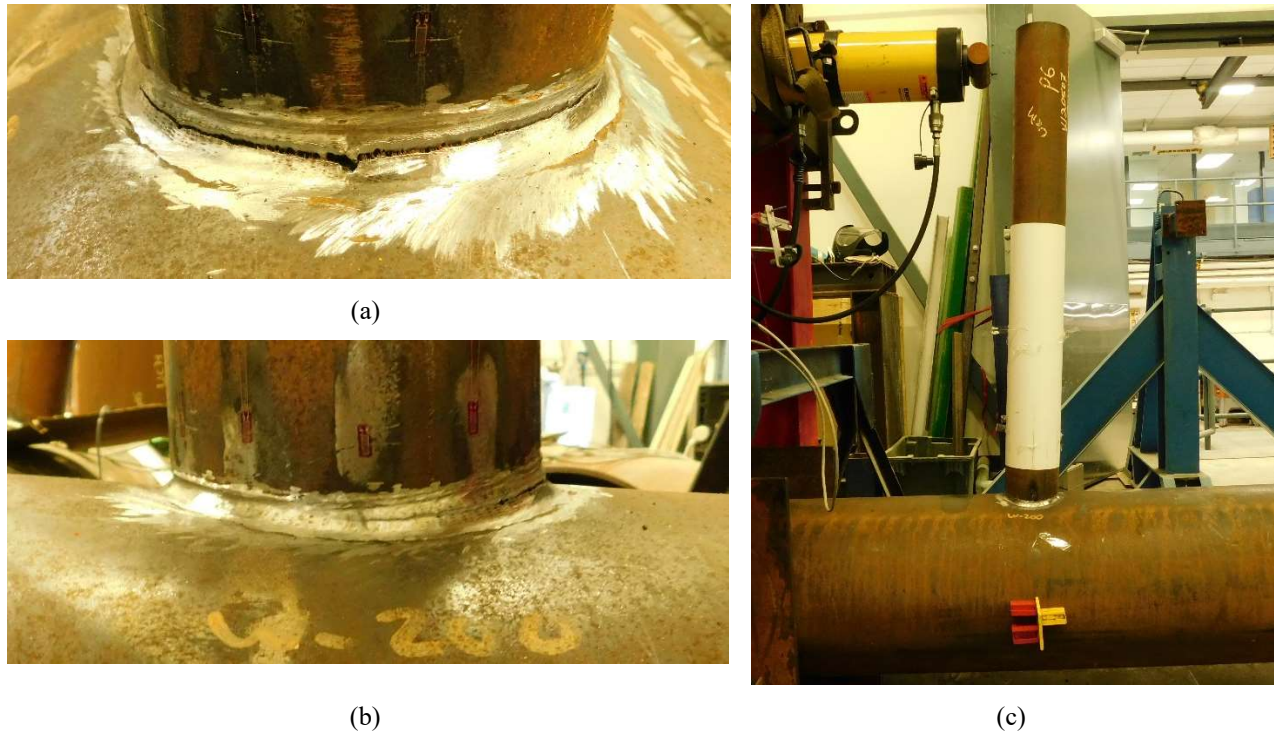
Failure of T406-127-1 (a) weld fracture, (b) chord deformation and (c) branch deformation
